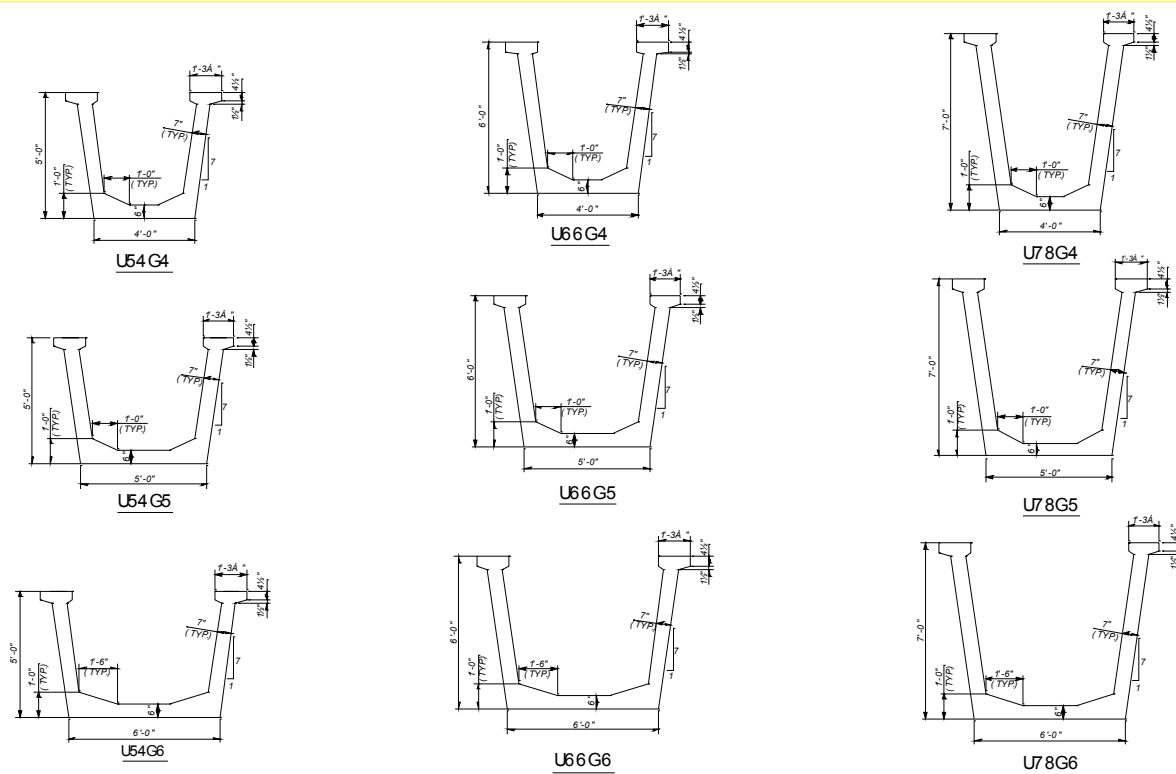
WSDOT Trapezoidal Tub Girders with Subflange
